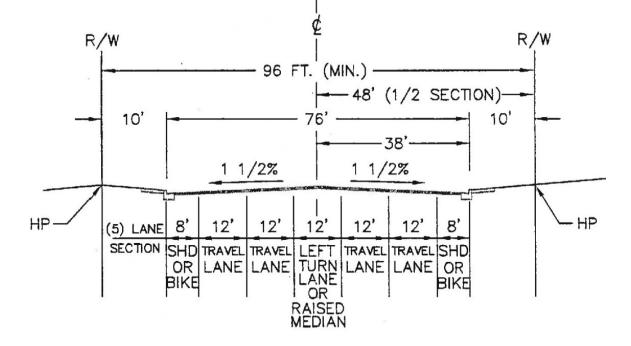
Arterial Street on 30-acre Property (Railroad Avenue)
